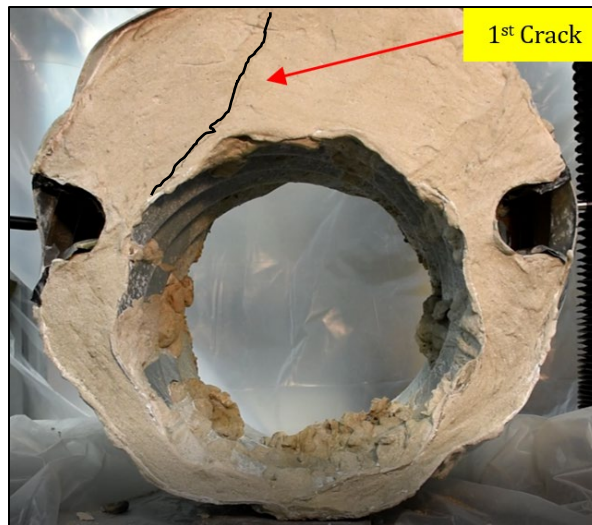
First Crack in a Culvert with C40 Cellular Grout with Voids at the Springline.
